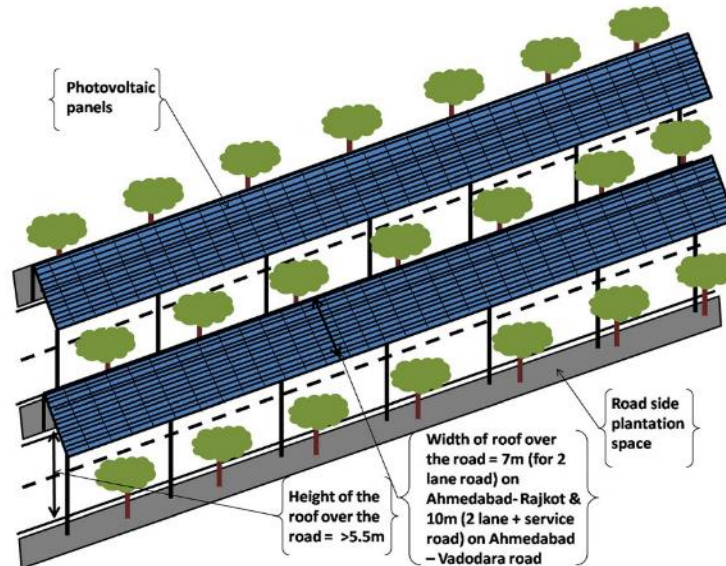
Schematic layout of a PV roof structure over a roadway [22]
